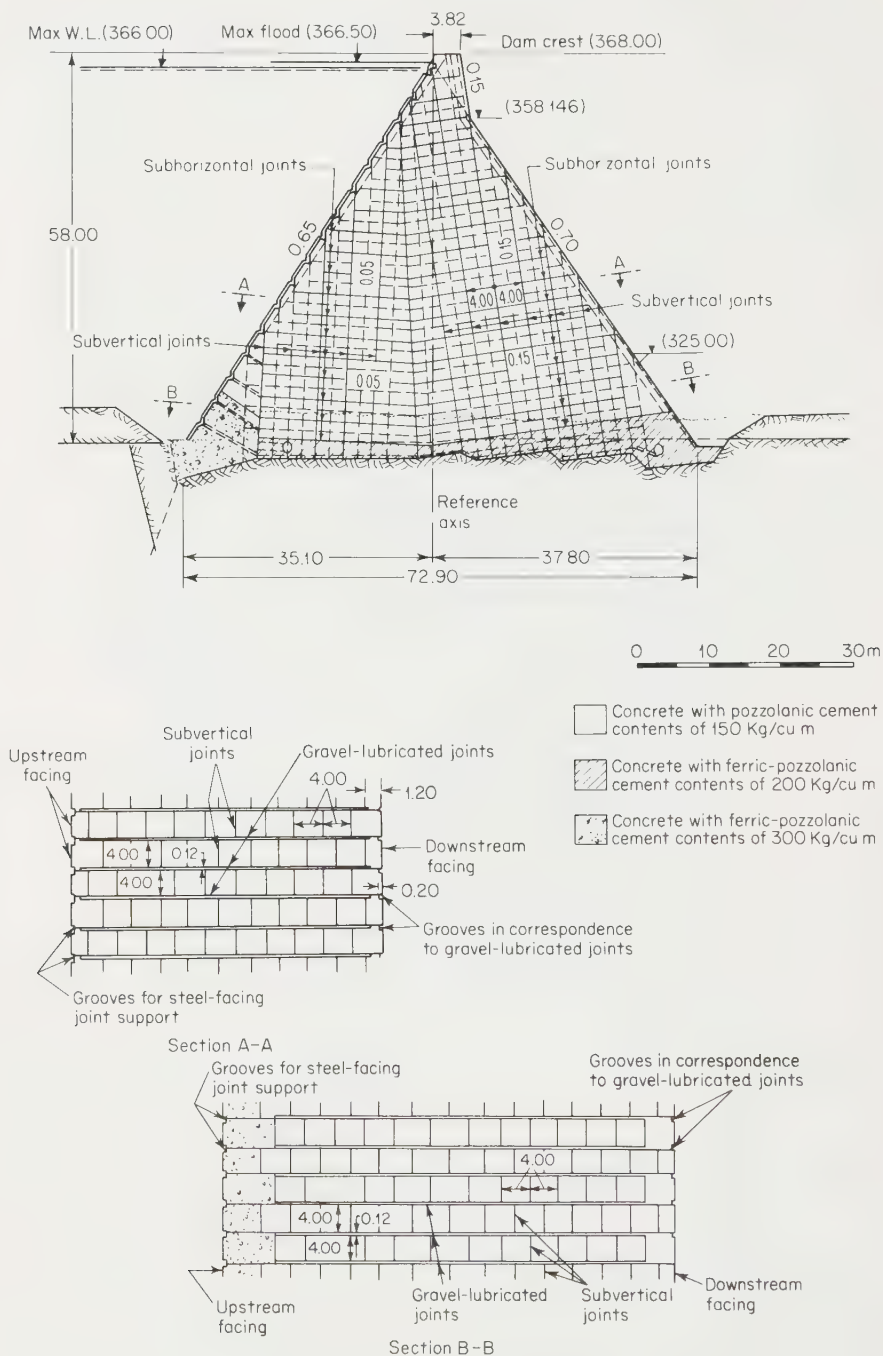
Typical cross section through Pozzillo Dam, together with sketches showing the system of joints.
